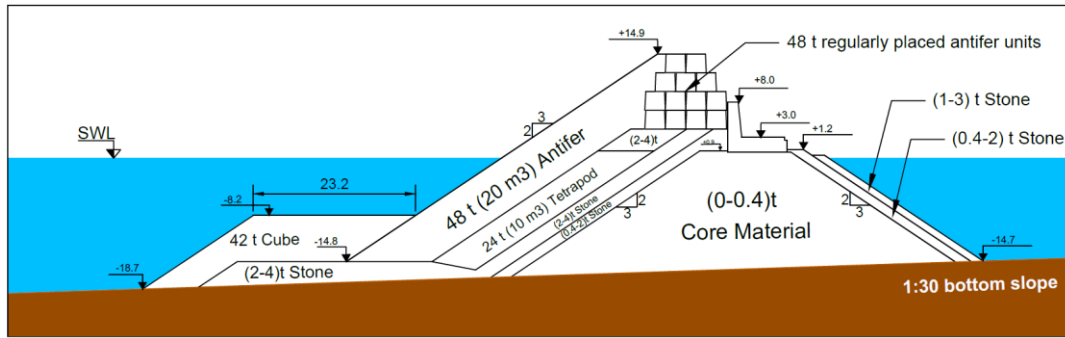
Cross-section of the first alternative for Section 4-4 given in prototype scale
